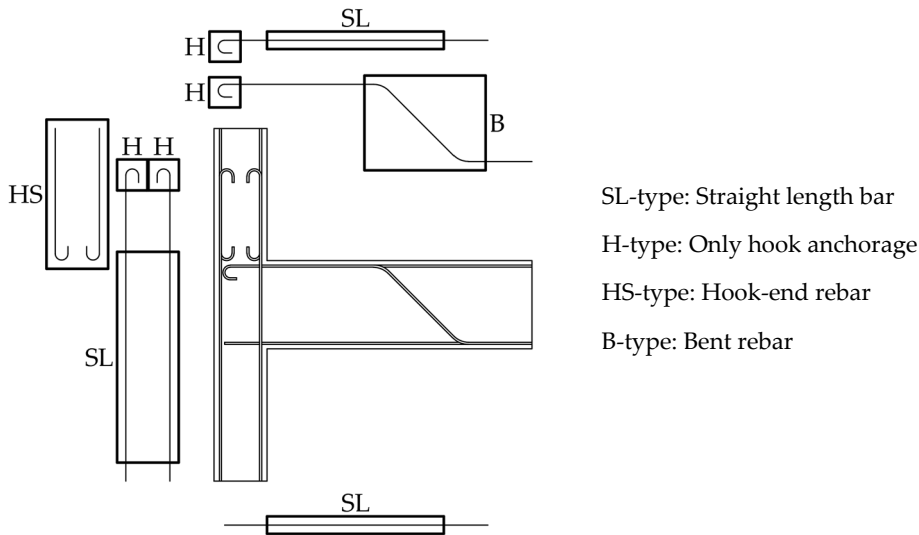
Example of the tested anchorage types for plain bars in a generic beam-column T-joint reinforcement arrangement.
